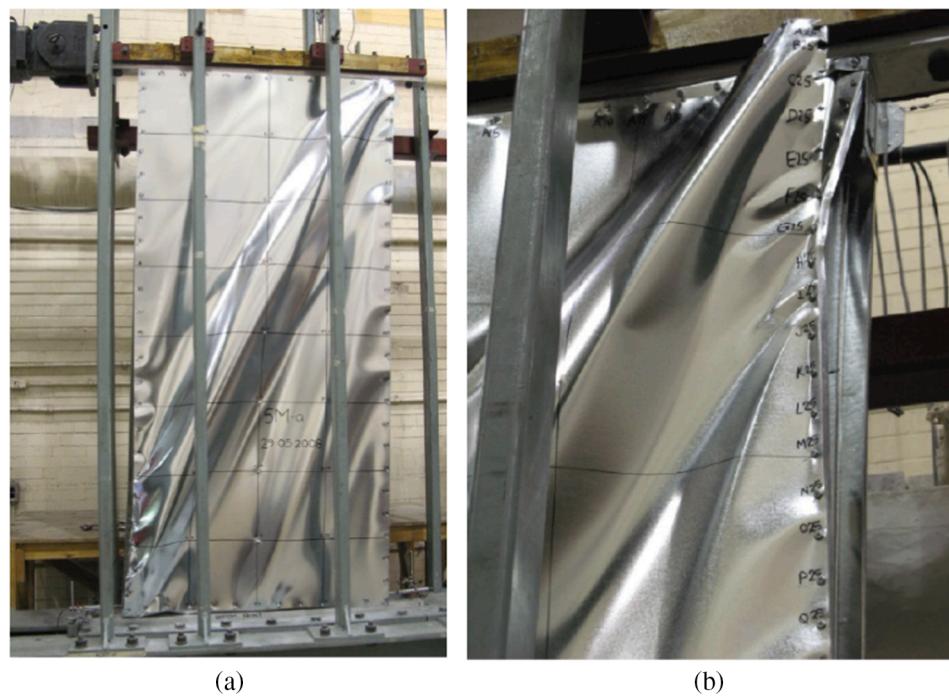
Examples of failure modes of walls with steel sheet sheathing: (a) buckling of steel sheet; (b) twisting of stud (image).
